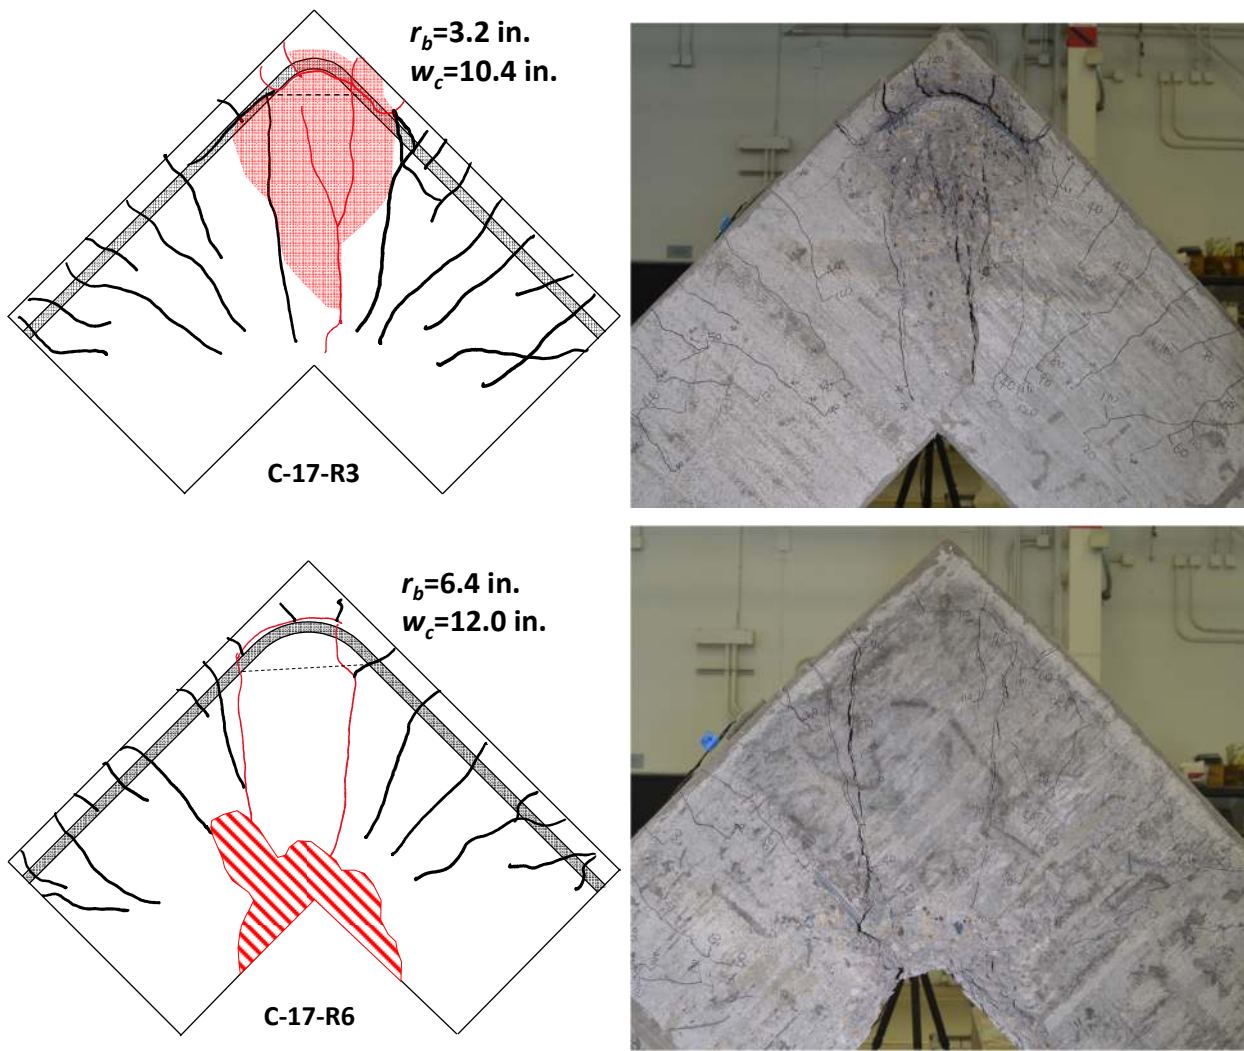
Crack maps and photos of C-Series specimens (Part 1)
